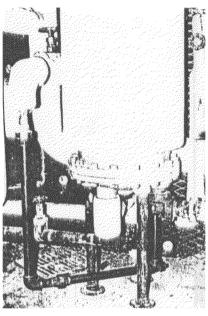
137. Hot water storage tank without base anchorage or flexible line connectors. Pipe legs are britle and commonly fail during earthquiges.
